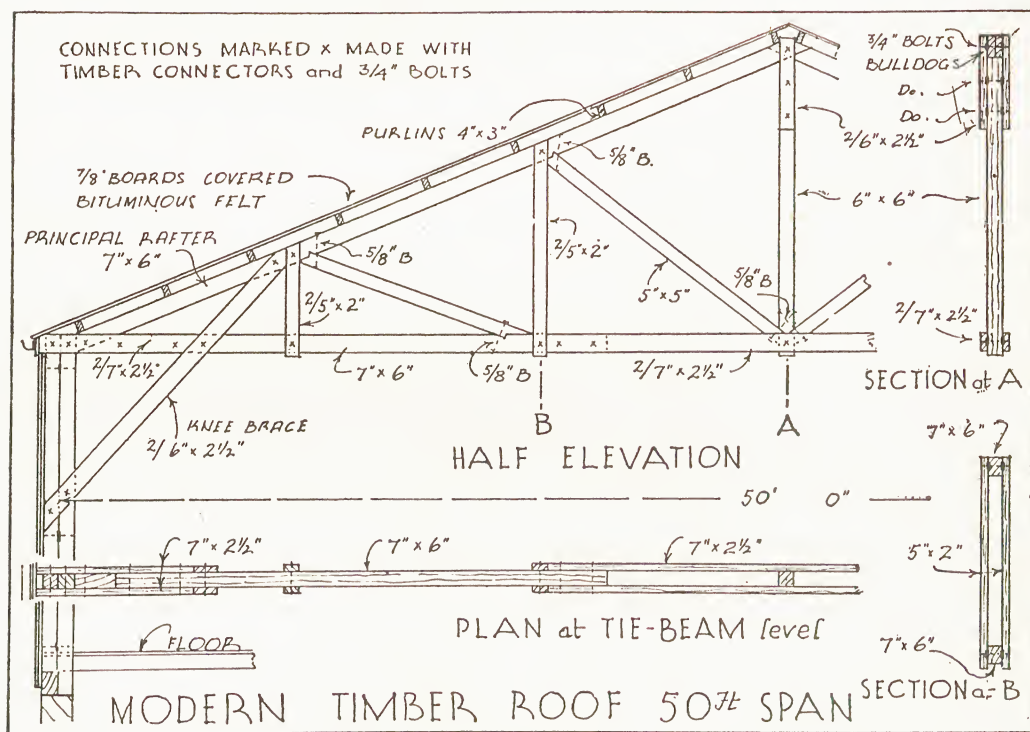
Modern timber truss, sandwich construction, joints made with timber connectors and bolts.
